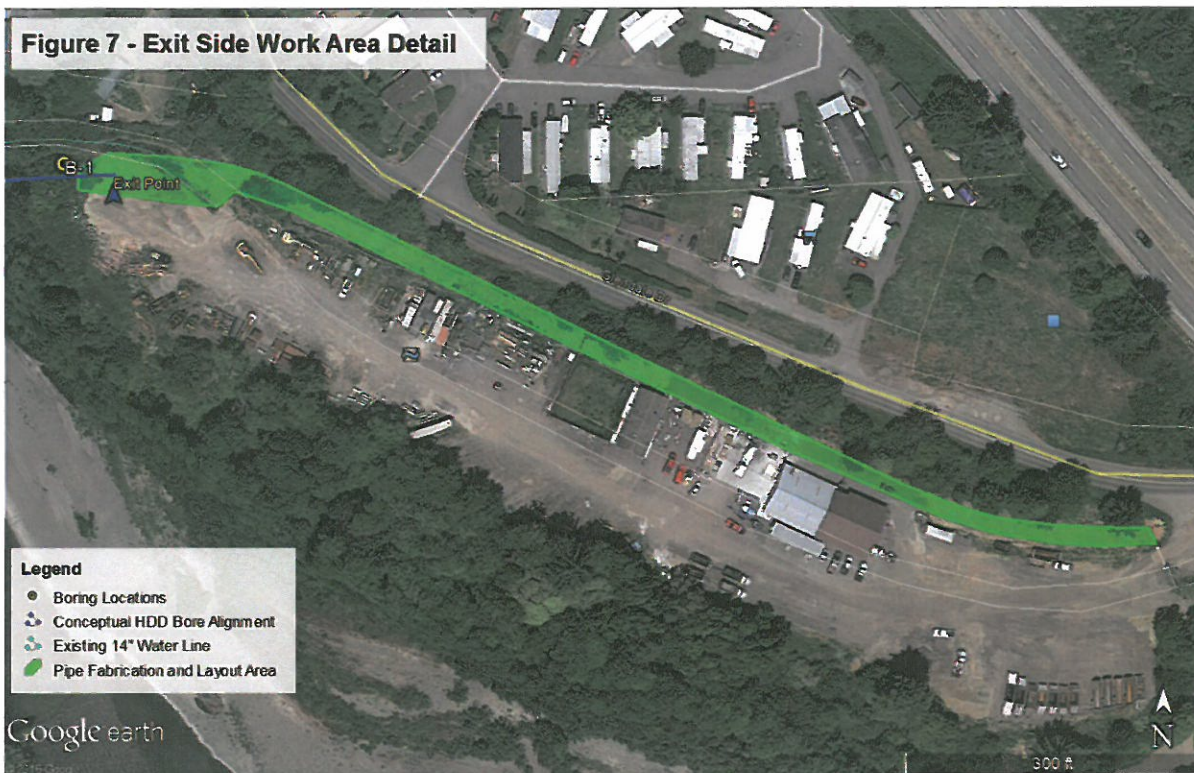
illustrates the proposed pipe fabrication and layout area on the east side of the river. The full length of pipe could be fabricated and laid out for pullback along an open, 20-foot wide corridor behind (north) the GR Sundberg equipment storage and workshop areas. This option is expected to minimize disruption to Sundberg’s operations during the HDD construction. However, if this option is not favorable to Sundberg, there are two alternative possibilities. One option would be to string the pipe through Sundberg’s main access drive, in front (south) of the buildings. The final option would be to continue routing the pipe east, through the row of trees along Glendale Drive, and then run the pipe along the south shoulder of the road, within the public right-of-way. This option may require closing a portion of the south edge of the road, but we believe that two-way traffic could be maintained on Glendale Drive with narrowed lanes.
